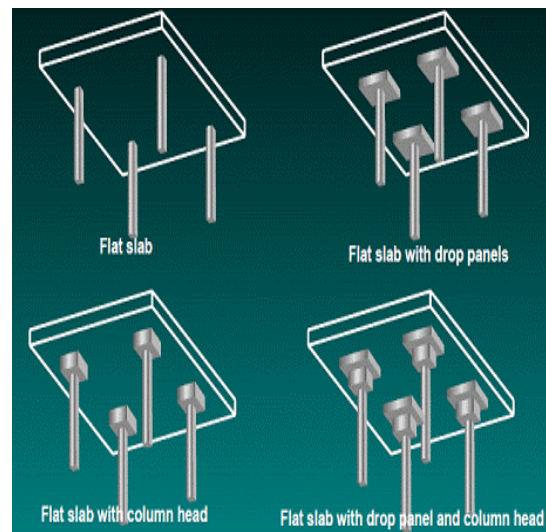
Flat slab column floor connections (Quora 18 June 2015)
